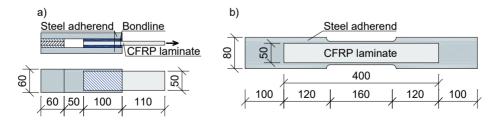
(a) Double steel-CFRP laminate-assemblies; (b) dumbbell specimen
